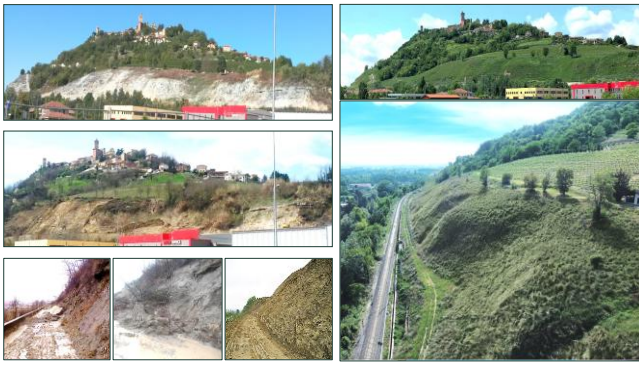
Piemonte, Santa Vittoria d'Alba – RFI: pre-intervention conditions showing superficial deposits affected by landsliding (left); post-intervention results, with hydraulic drainage network installed on the existing soil (right)
